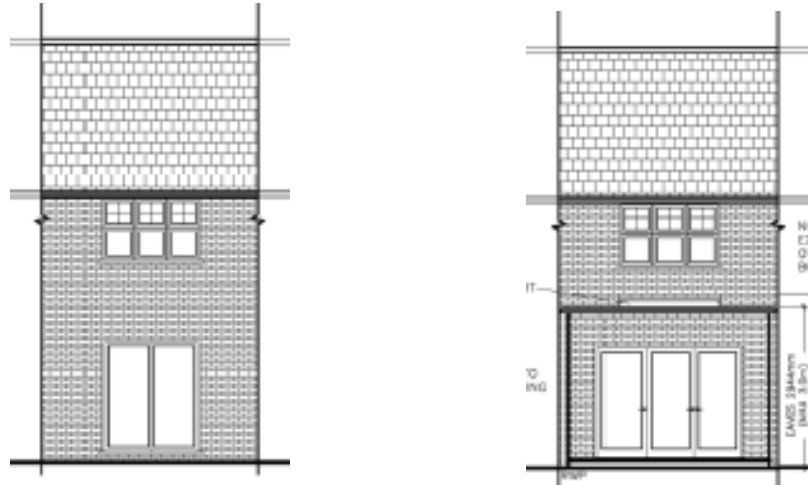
Existing rear elevation (Left) and proposed rear elevation (right)
